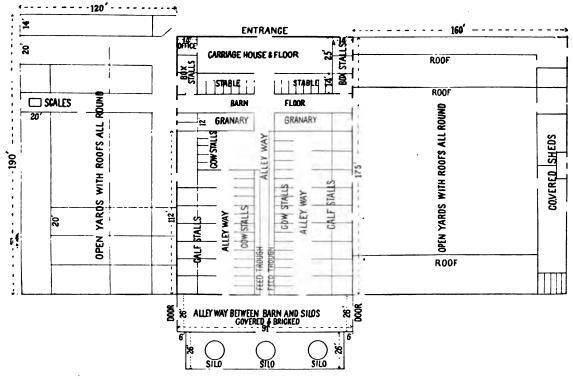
CATTLE BARN WITH OPEN YARDS (FLOOR PLAN).
